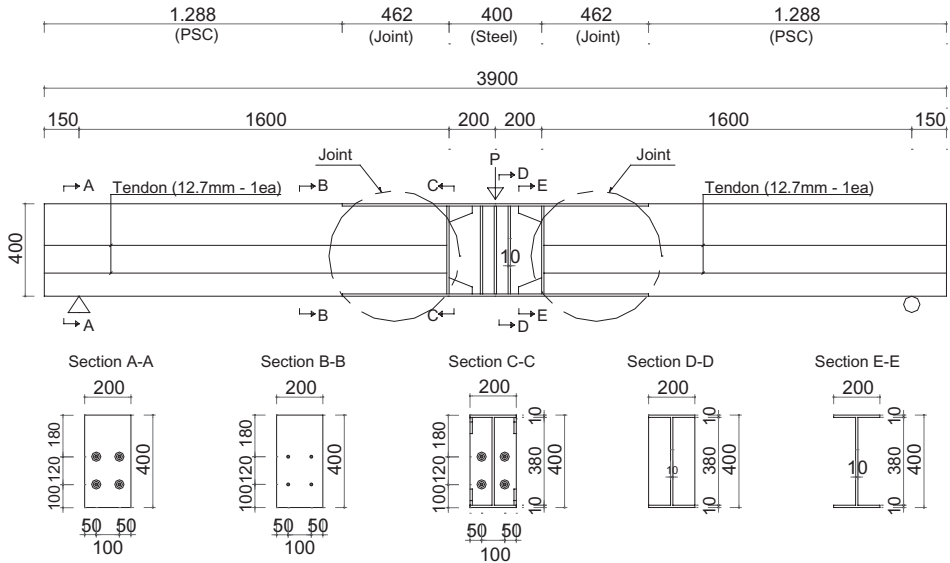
Layout of a beam with 3.9 m length (unit: mm).
